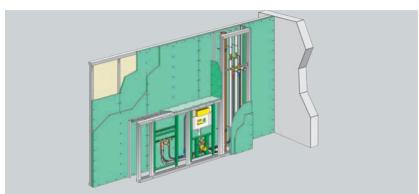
175 Viega Eco Plus in lightweight construction wall
